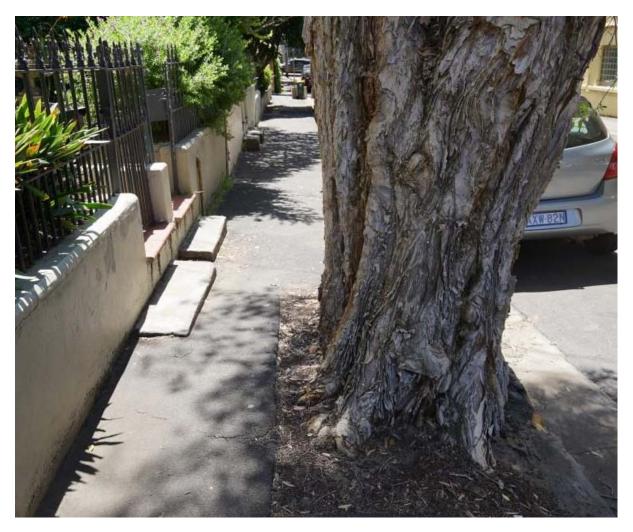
Narrow Width of Pavement restricted with tree area and residential steps
